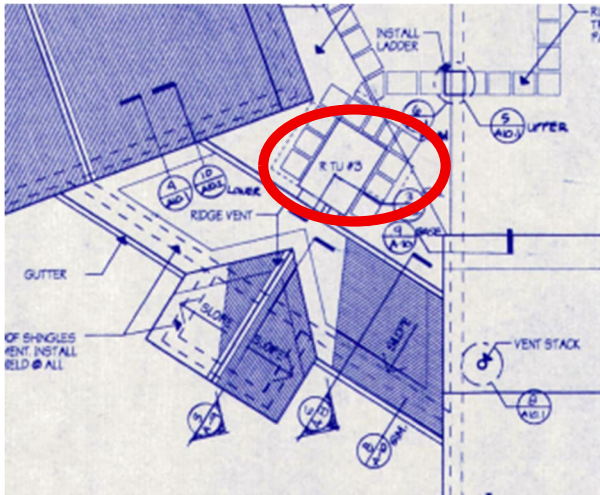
ROOF PLAN DETAIL @ RTU#3
